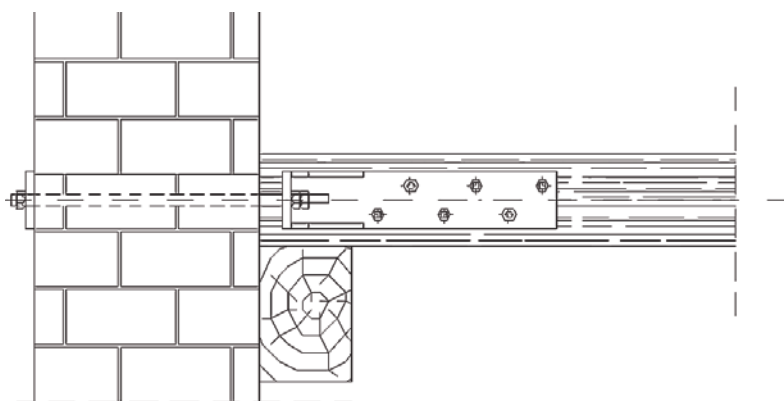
Strengthening interventions, diffuse wooden floor connections to the masonry wall
